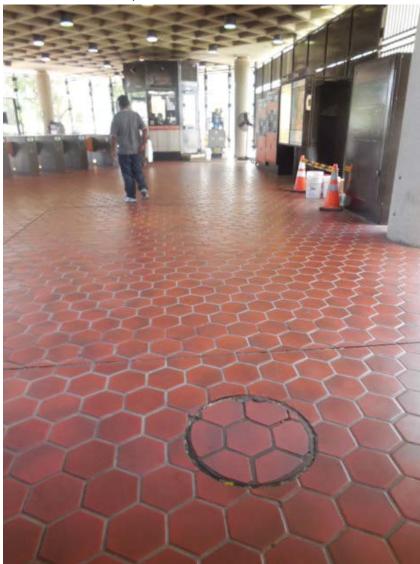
E07 West Hyattsville – Handhole in mezzanine floor
